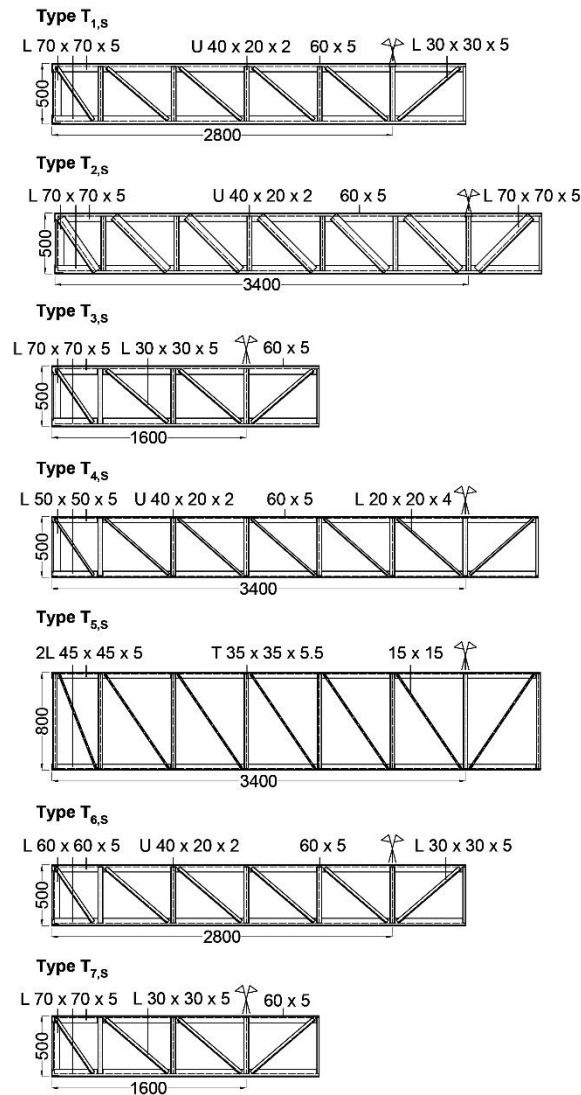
Reticular steel beams: lateral view and constituting profiles.
